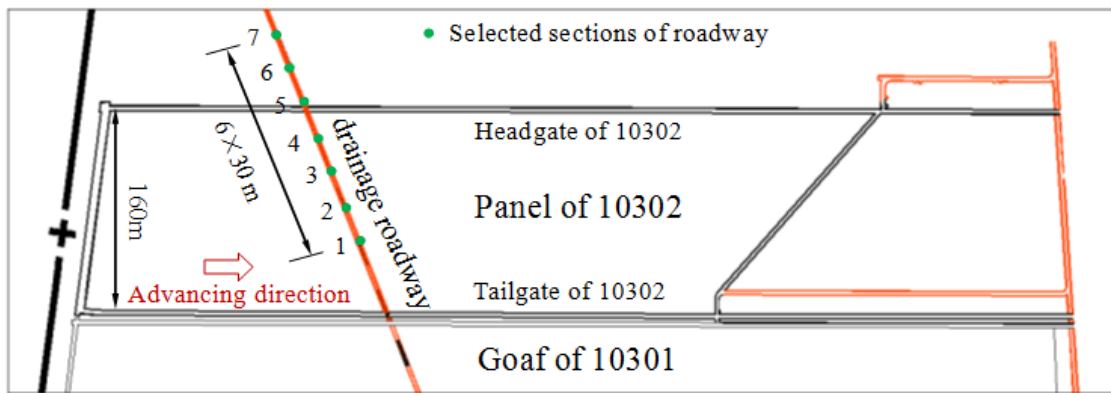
Plan of panel 10302 and the layout of roadway sections.
